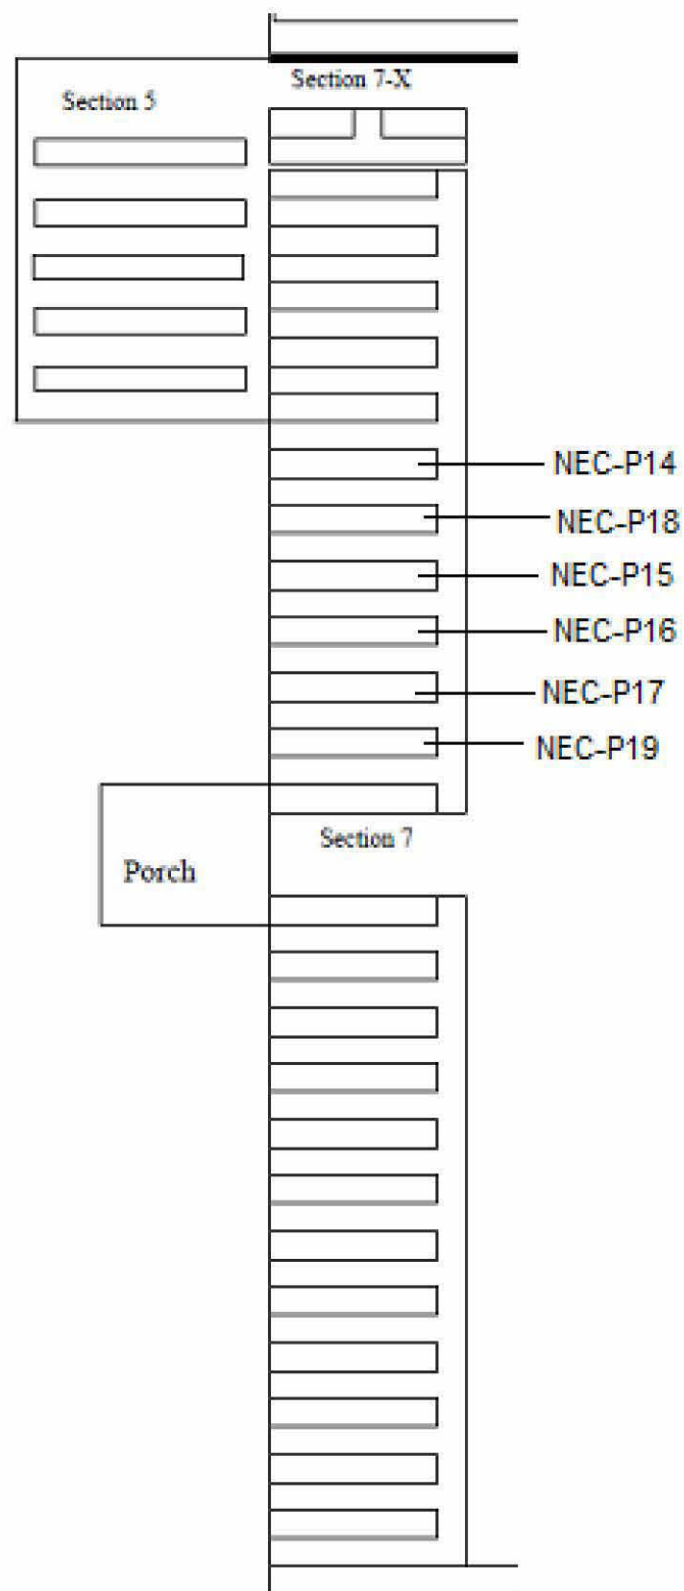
Plan of north aisle, showing the location of samples NEC-P14–19
